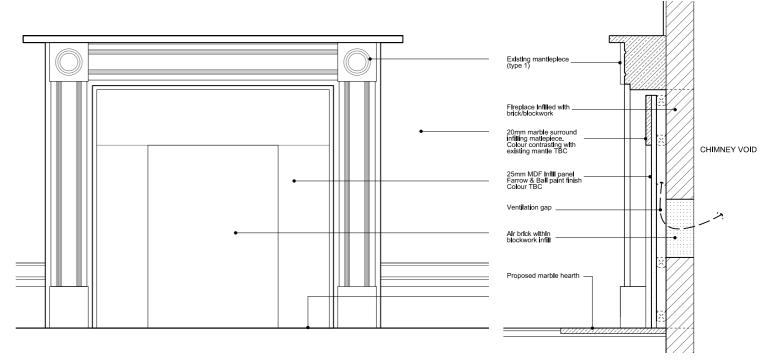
Proposed treatment to typical fireplace (type 1) elevation and section
